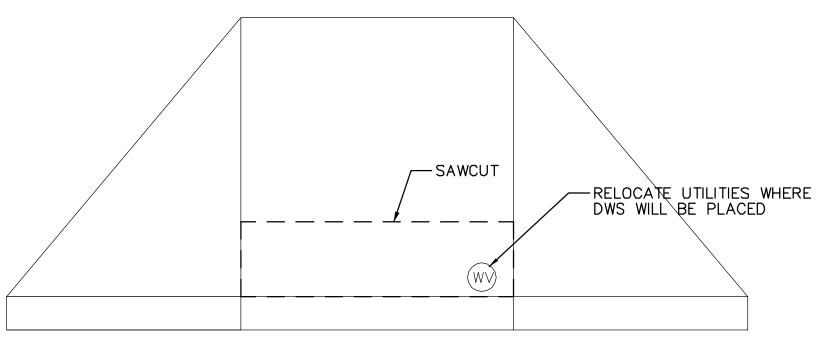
DETAIL ILLUSTRATES CURB RAMP (INCLUDING FLARES) REPLACEMENT.
